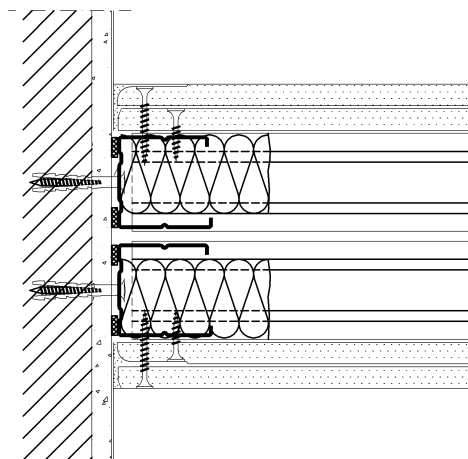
Sectional drawing of metal stud partition W115, Source: www.knauf.de
